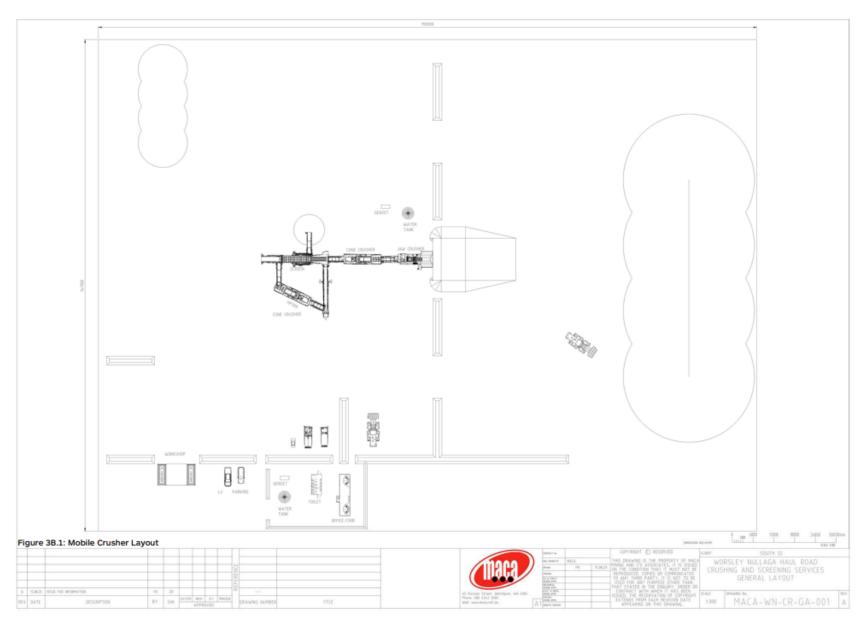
General layout of the crushing and screening plant and associated infrastructure (sourced from South32 2023)
